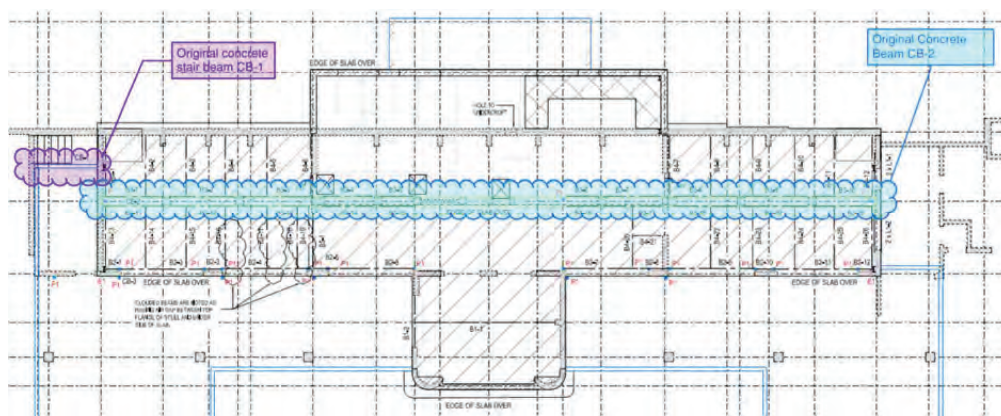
Shows original concrete beam CB2 in blue and CB1 in purple.
